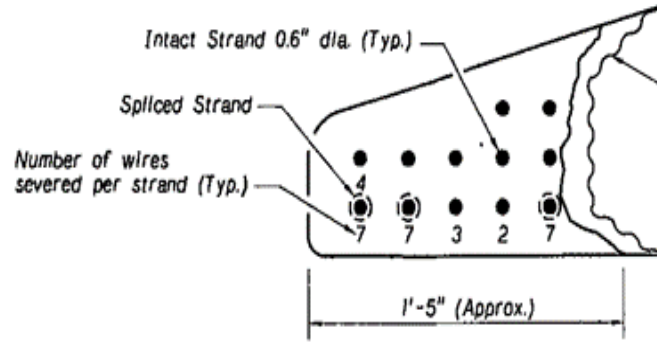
Severe II damage, five severed strands and vertical downward deflection, camber of +1 in. at undamaged girders and -0.48 in. at Girder (E), NDOT Wood River Interchange Bridge Girder (E), courtesy of NDOT
